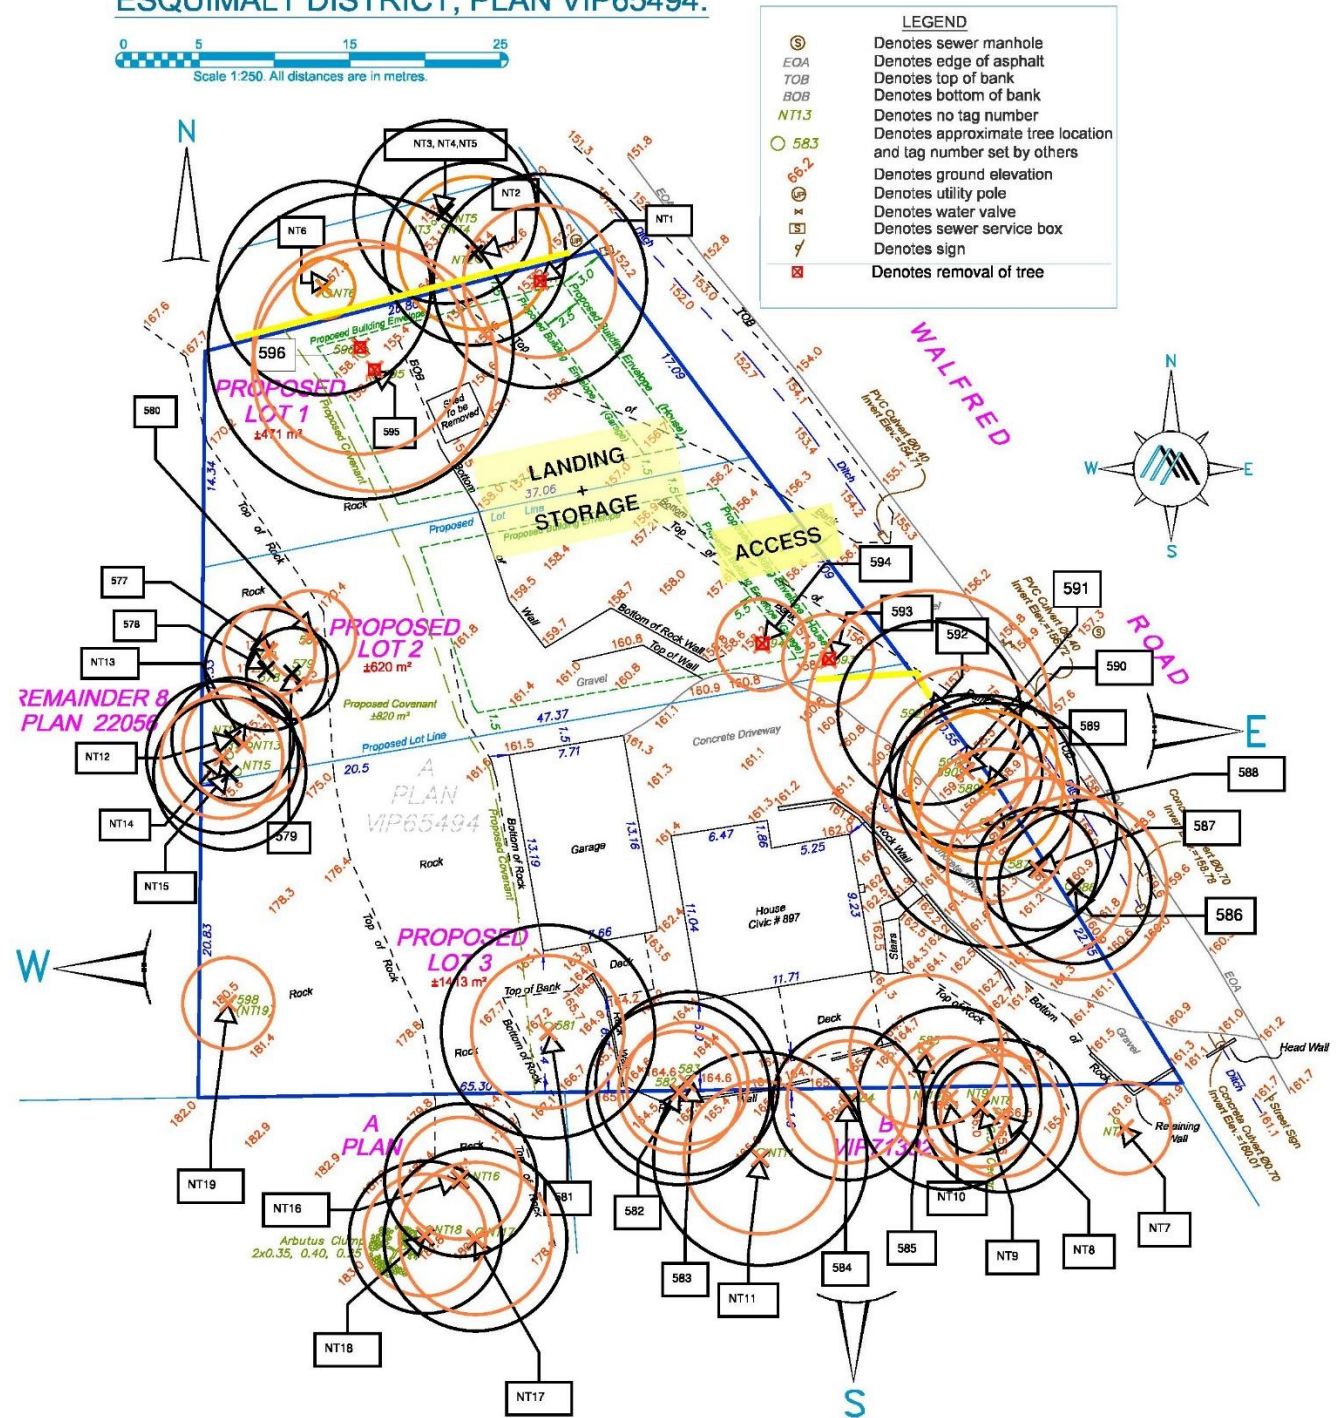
Site Plan. Yellow lines indicate Tree Protection Fencing. PRZ is indicated in black, CRZ indicated in Orange, CRZ will overlap PRZ where both are the same. See Appendix C for Tree Protection Fencing specifications.
